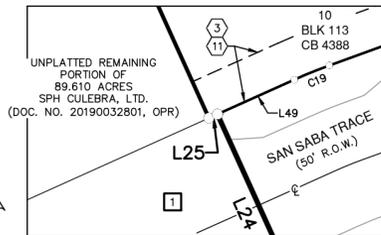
DETAIL "D" SCALE: 1" = 30' (SEE SHEET 1 OF 3)
